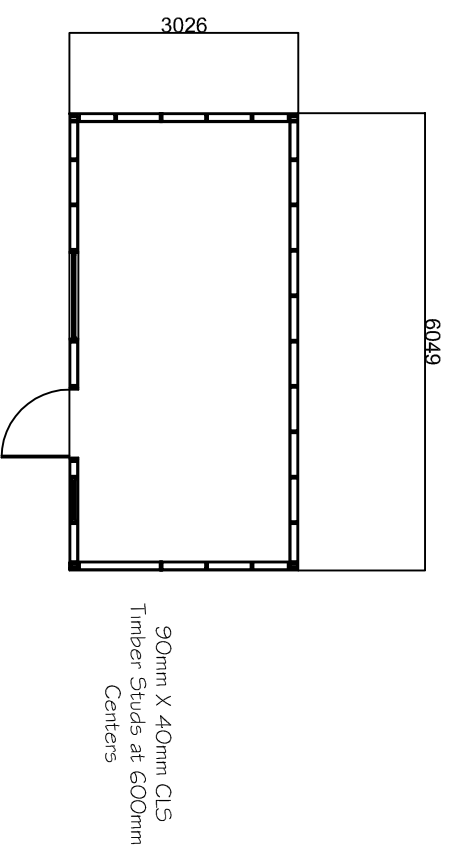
of 7 Proposed Large Open Fronted Horse Shelter
